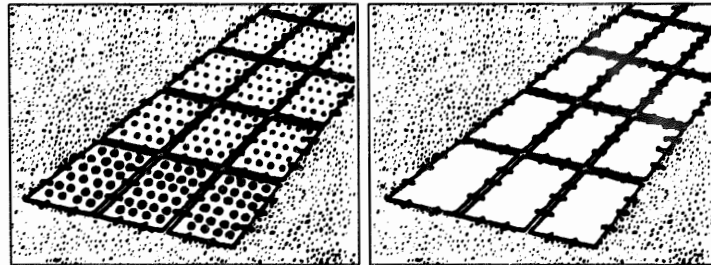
Expedient runways of pierced steel planking (left) and aluminum mats (right)
